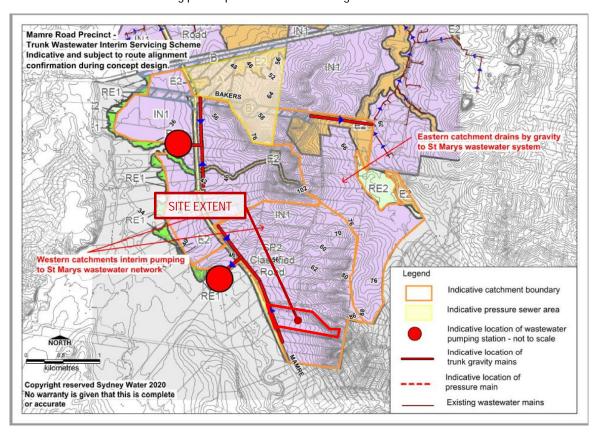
Indicative wastewater servicing plan (Sydney Water)
